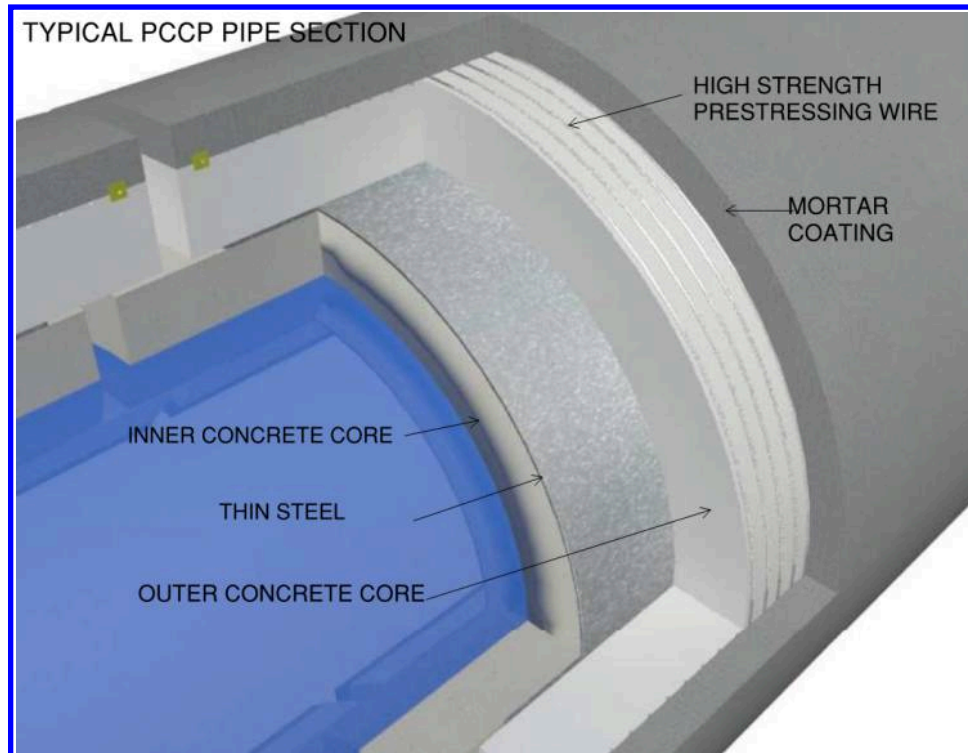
Components of an ECP-type Prestressed Concrete Cylinder Pipe Section
